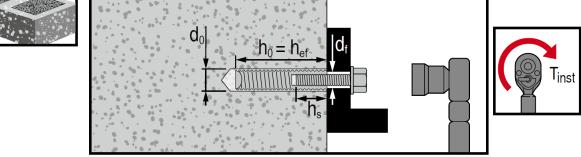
HIS-(R)N Installation in Fully Grouted CMU
